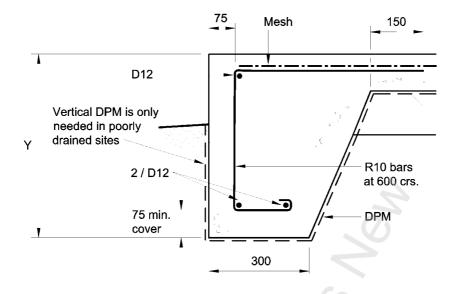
Reinforcement of footings (see table 6.2 and 6.6.2)
